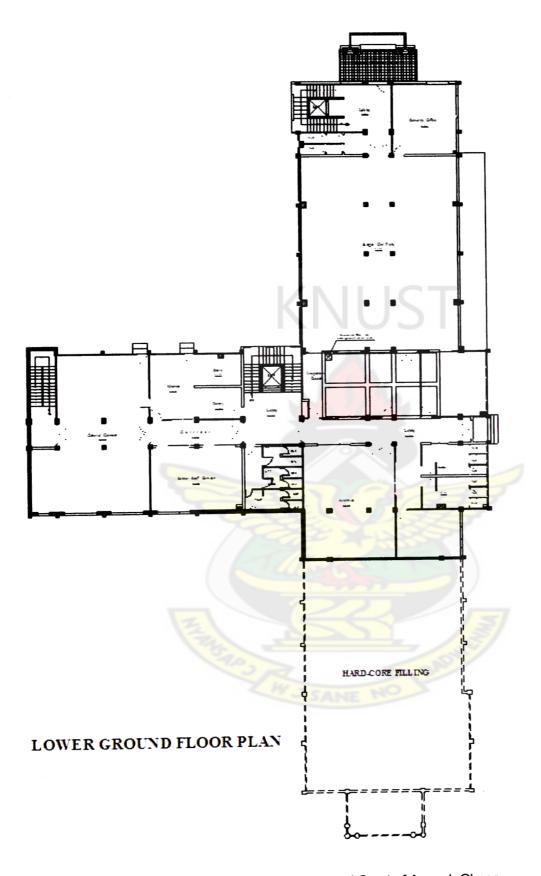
Lower Ground Floor Plan. Kumasi Court of Appeal, Ghana.
